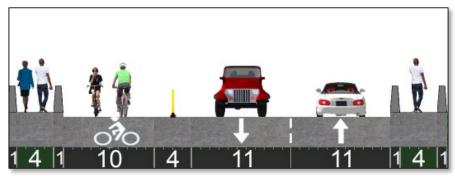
Proposed Condition: Joyce Road Bridge over Rock Creek
